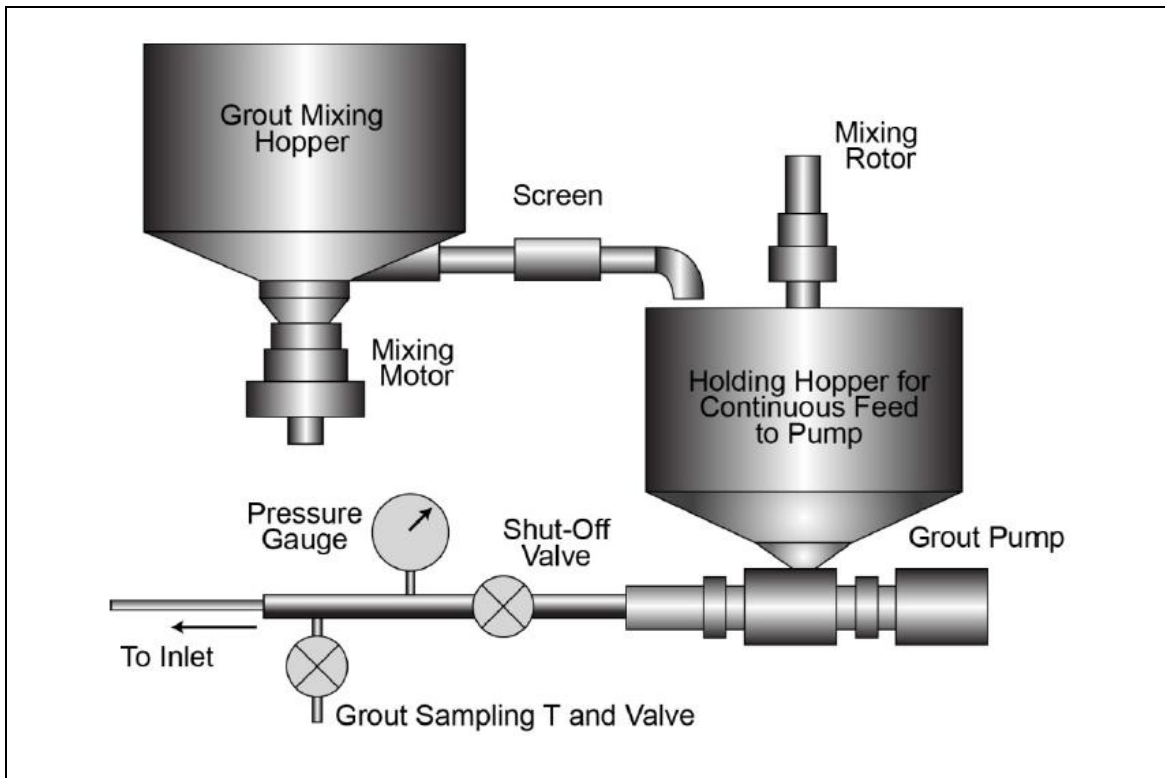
Example of Grout Mixing and Pumping Equipment
